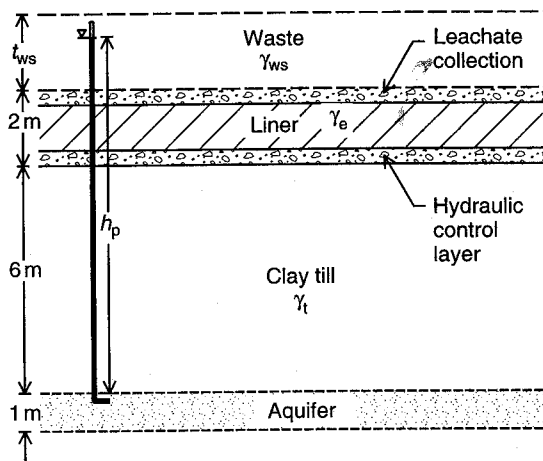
Schematic of natural soil, liner system and waste used for example blowout calculation.
